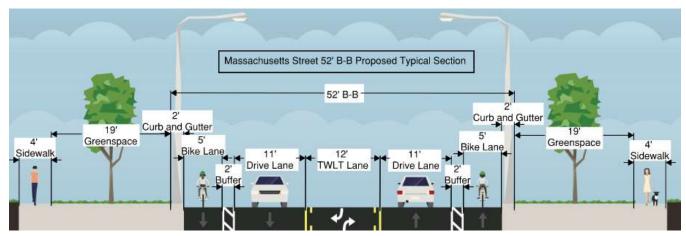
Proposed Typical Section - 4-Lane to 3-Lane Roadway Reconfiguration
